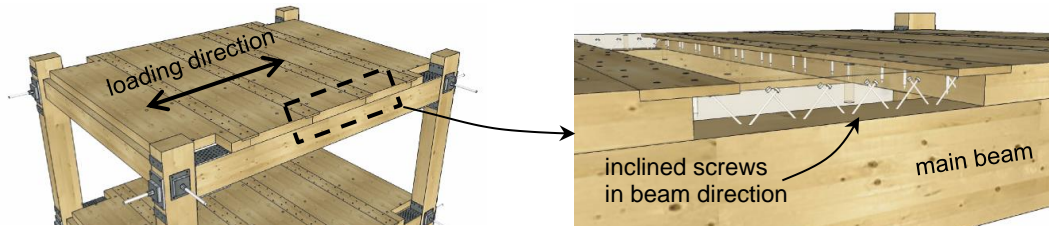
Experimental setup of the 3 storey post-tensioned glulam frame building; timber flooring, attachment and additional mass arrangement (modified from Smith (2014))
